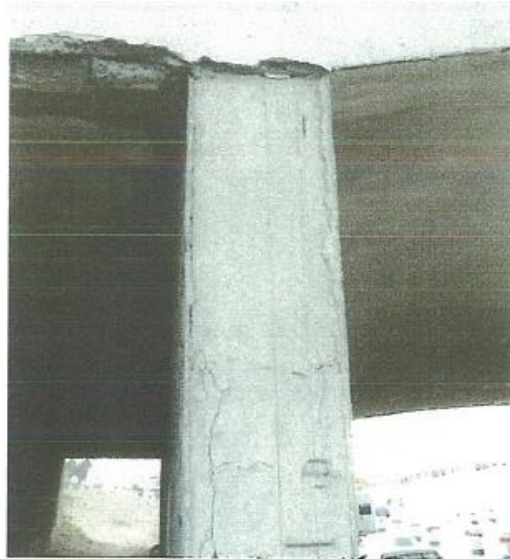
Interior wall; longitudinal cracks near edges due to corrosion of reinforced bars
